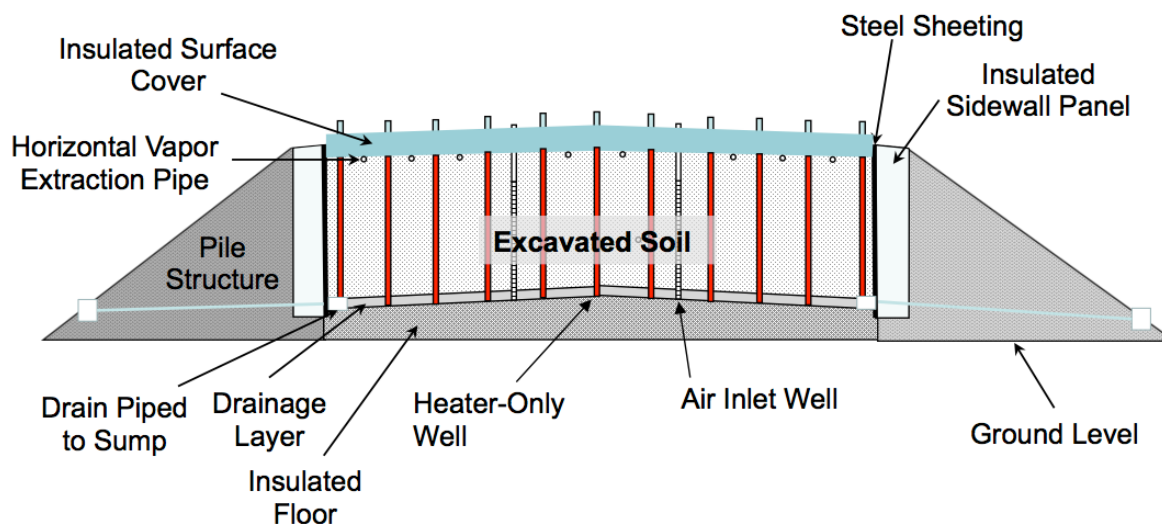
Cross-section of IPTD<sup>®</sup> treatment pile.
